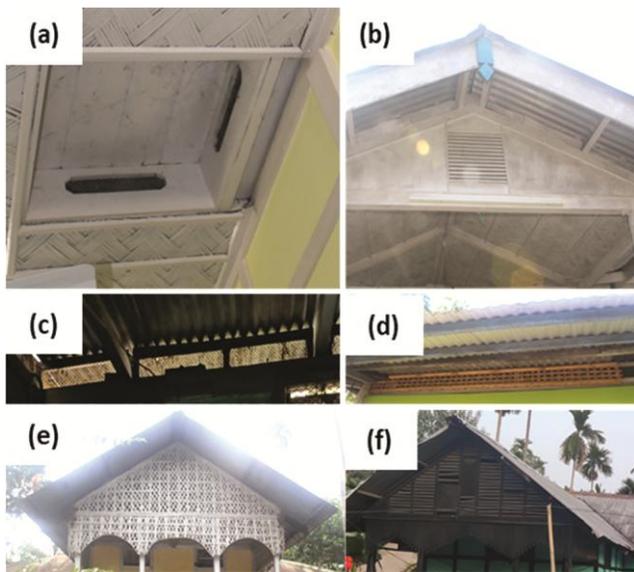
(a) Interior opening of attic (b) exterior opening of attic (c) & (d) gap between roof and wall (e) & (f) bamboo shading device
